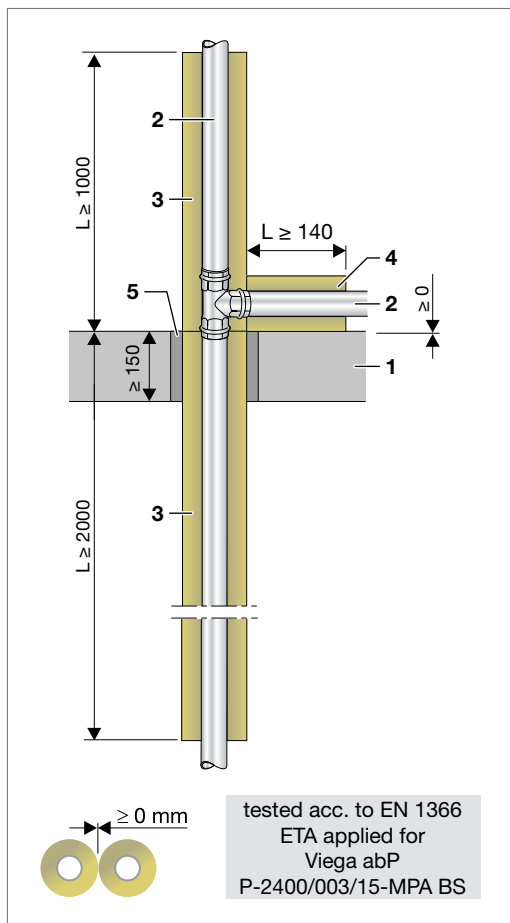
Storey connection with Viega piping systems – above the ceiling
